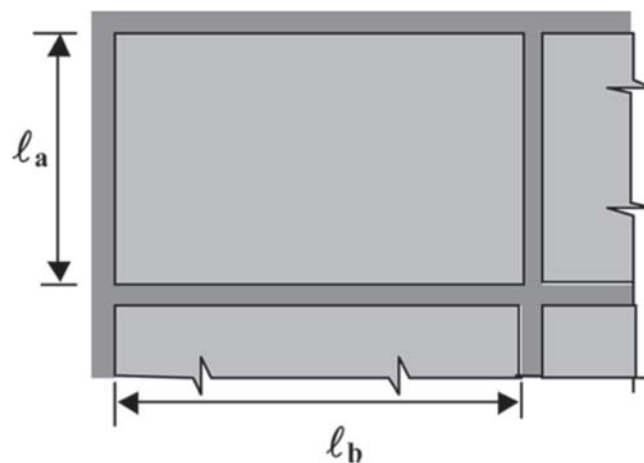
Edge panel with ℓ_b parallel to edge of two-way slabs supported on girders, beams, or walls.
